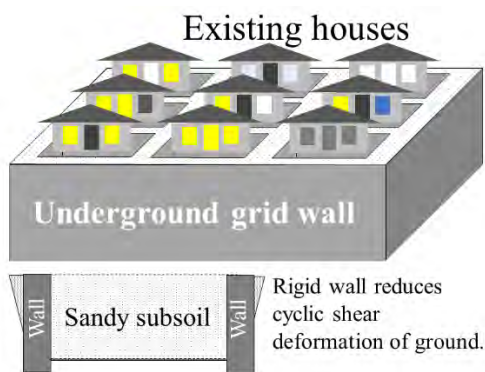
Mitigation of liquefaction risk by installed underground walls of grid shape in narrow space among houses
